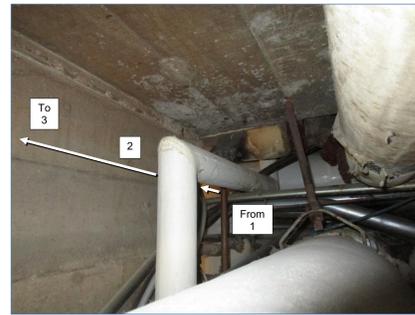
Location R, conduit mounted to wall after 90 degree turn at tunnel intersection
